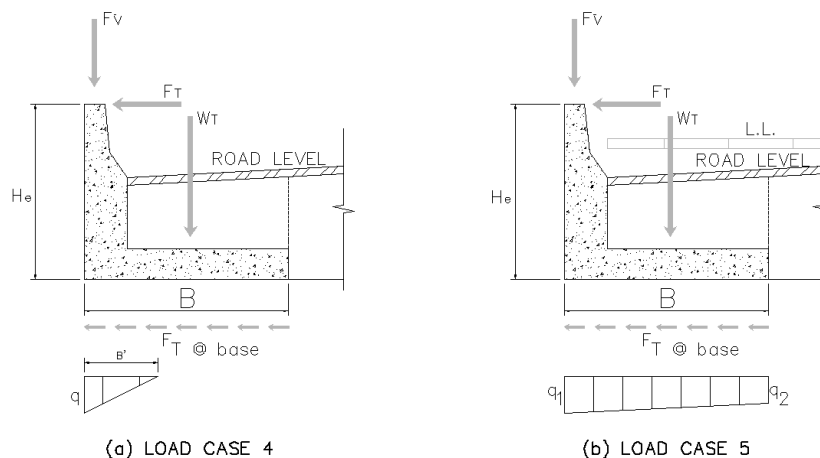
Maximum Soil Pressure at Soffit of Crash Barrier Footing for Load Case 4 and Load Case 5.
